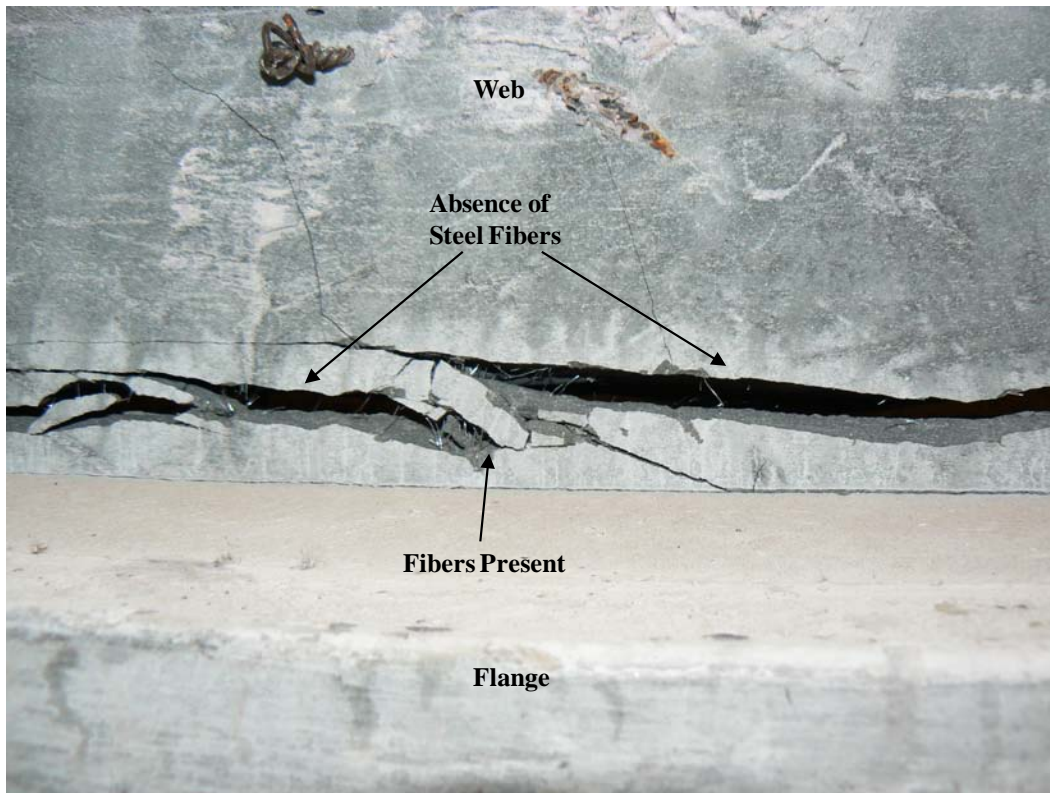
Crack in web of UHPC test unit L2 showing absence of sufficient steel fibers bridging the unexpected cracks
